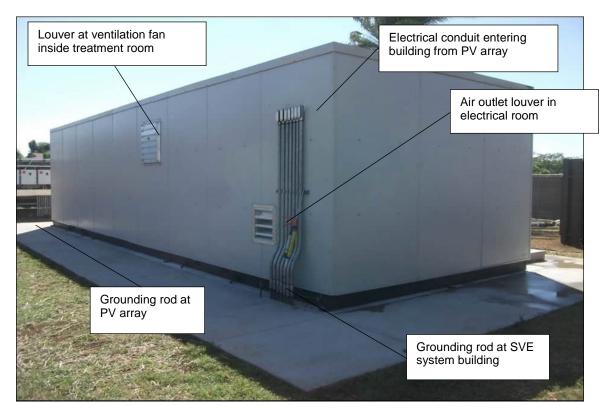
Electrical conduit entering SVE system building, and grounding rod locations
